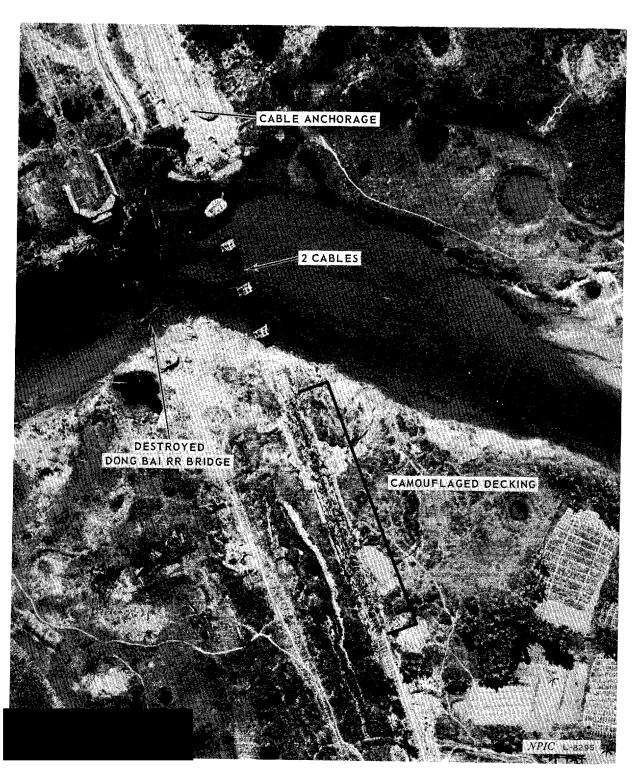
RAILROAD CABLE BRIDGE, DONG BAI, NORTH VIETNAM
